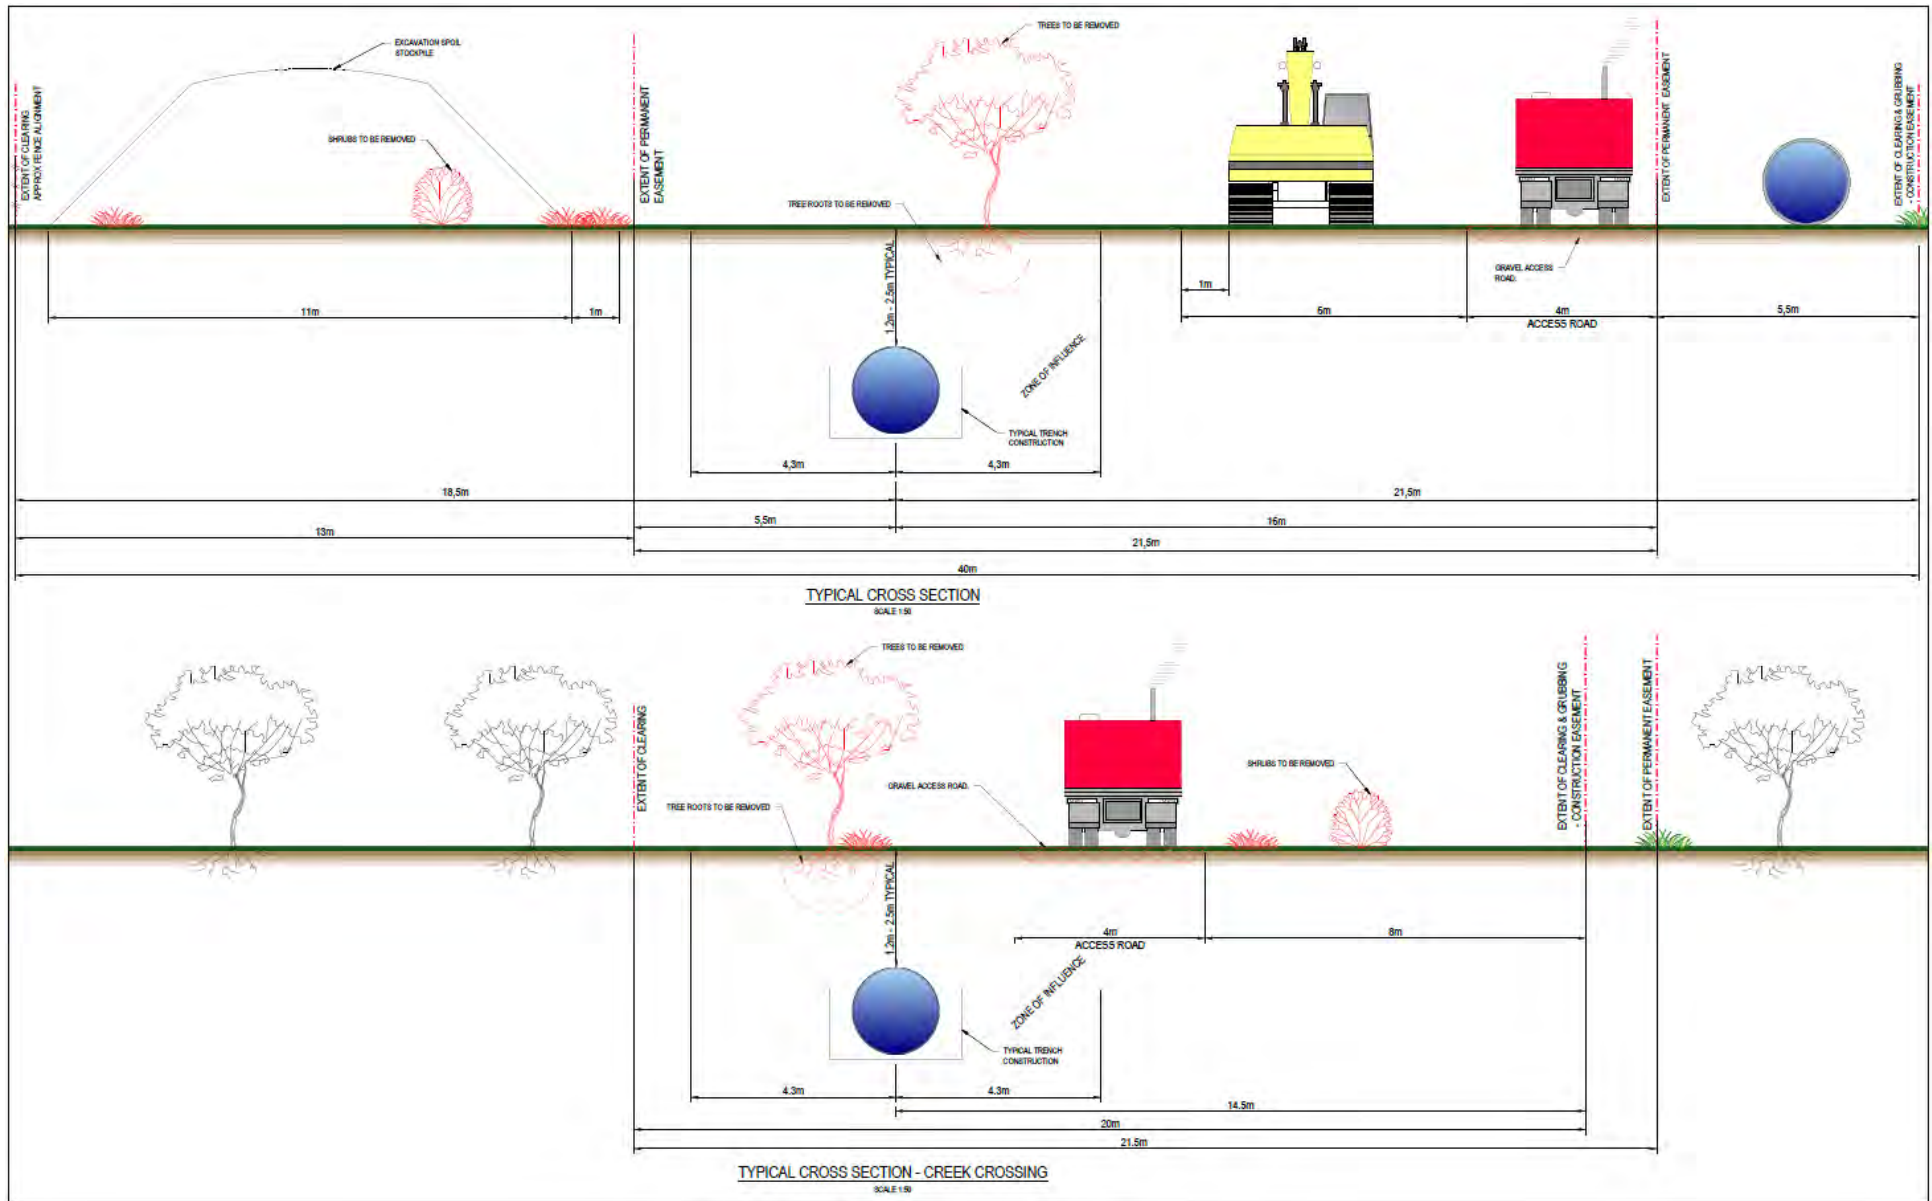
Pipeline corridor typical cross section (construction corridor and permanent easement)
